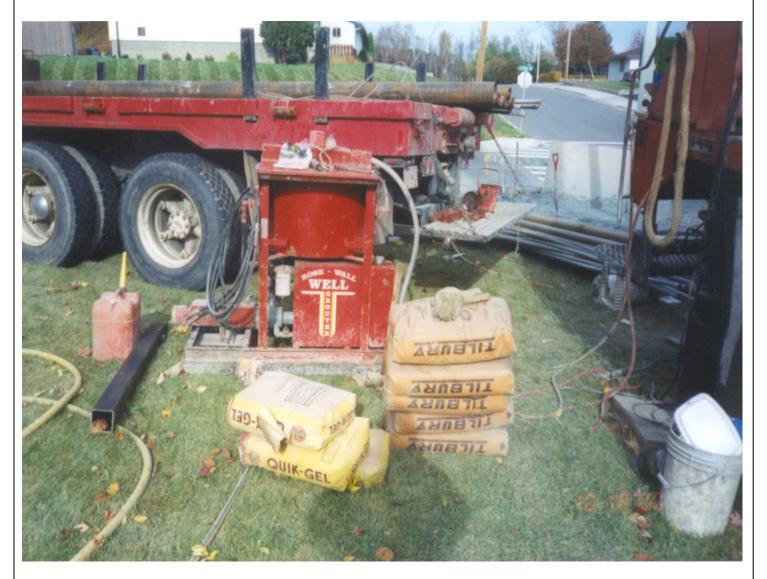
Grout Mixer and supplies taken at SI-7 located at Lewis Drive and Pierce Crescent
